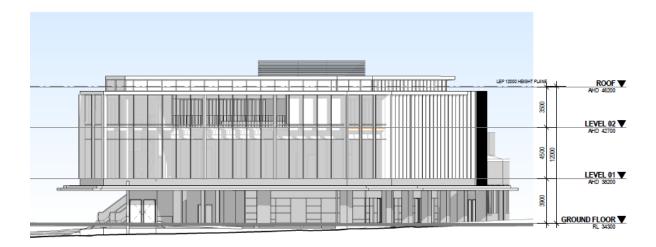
Pre-DA Scheme 2 - Marriott Street Elevation
